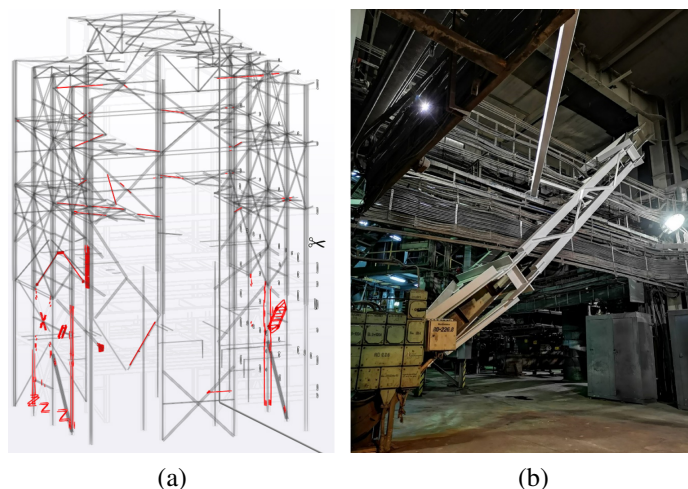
Reinforcement of the boiler room structure: a) applied reinforcement – new elements shown in red, b) example of a bracing reinforcement that omits existing electrical wiring
